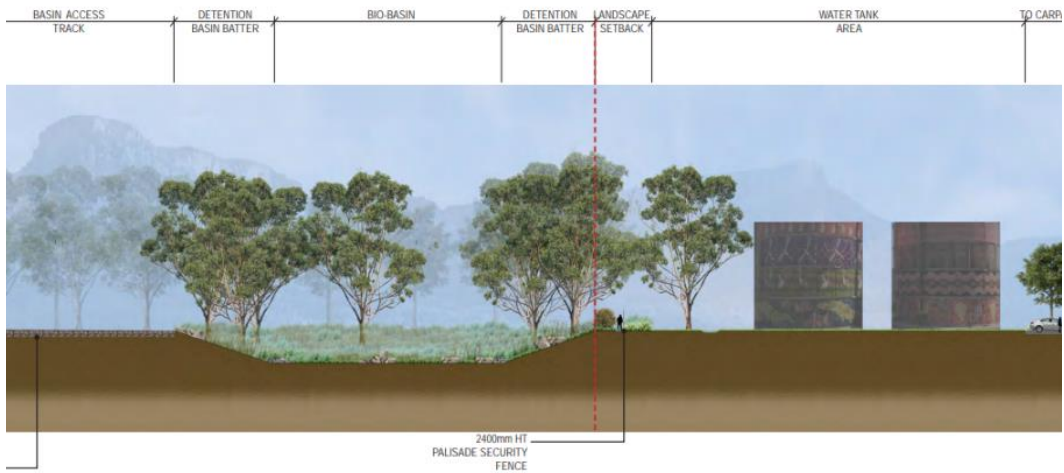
(above) – Landscape Section through Basin 1 - Excerpt from Habit8 plan no. L12 revision J.
